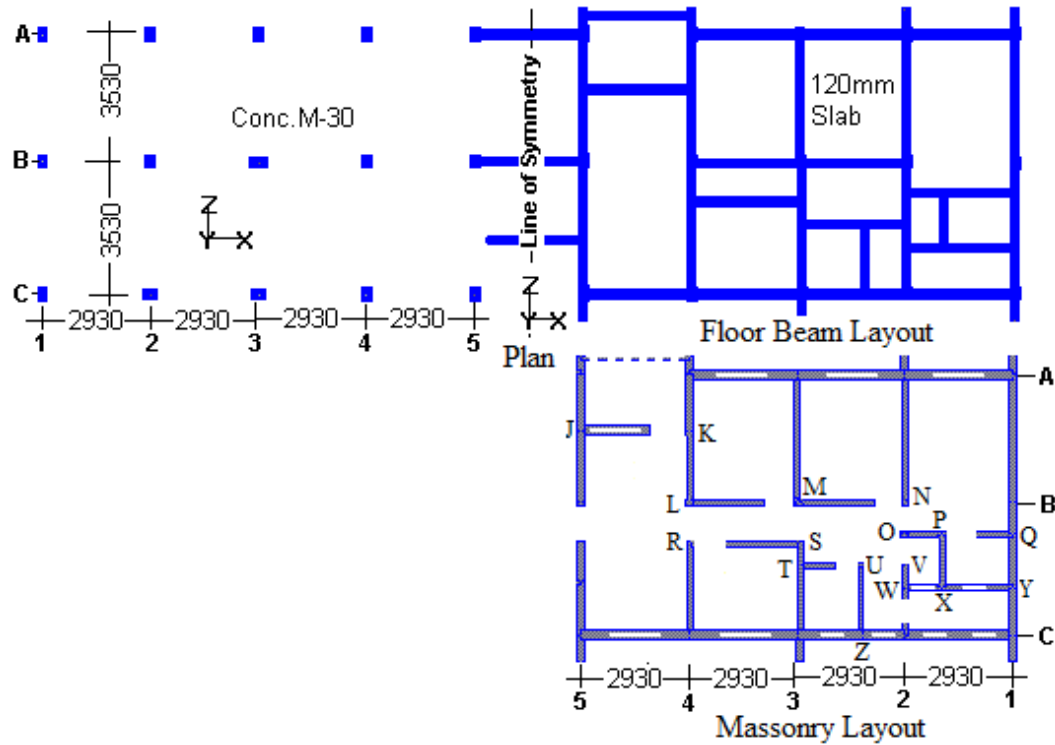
Structural floor plan and masonry layout of existing structure 'ES'
